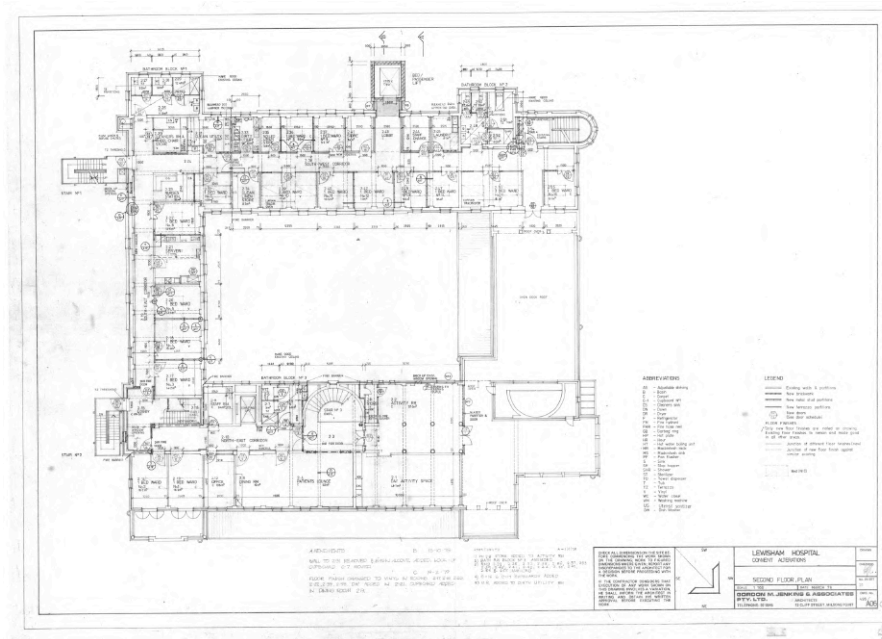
Lewisham Hospital Convent Alterations Second Floor Plan
